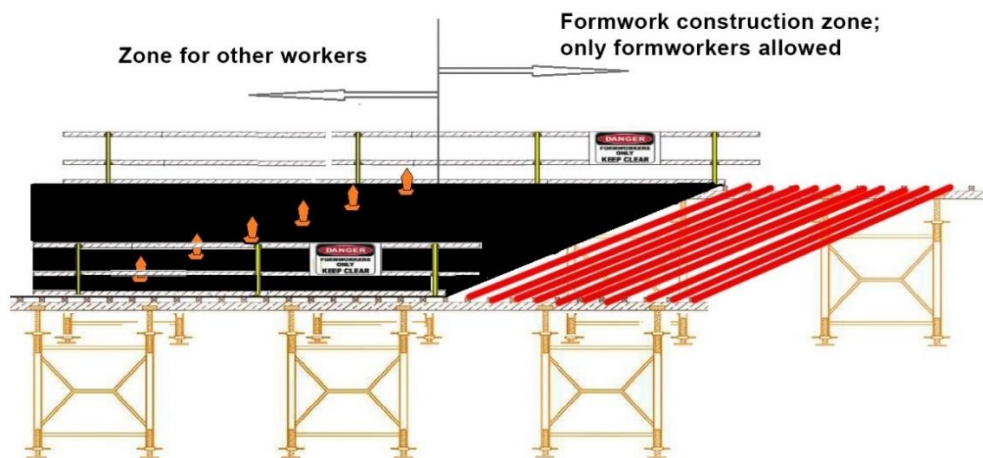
defining work zones. Example of defining work zones for other trade workers and formwork construction. Note guardrails removed for clarity.
